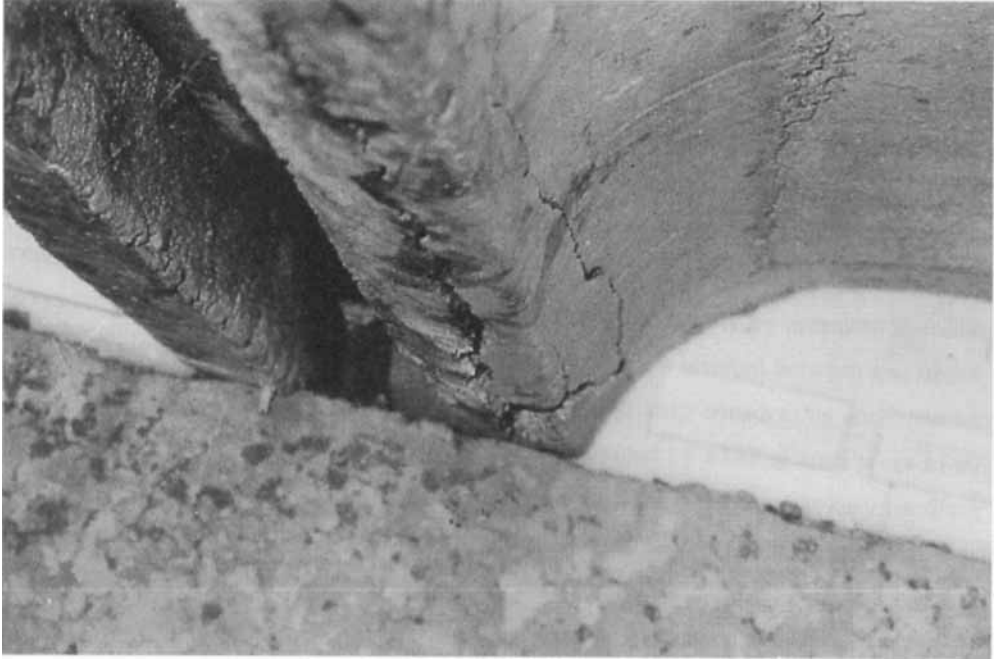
Heavy corrosion damage in precast ground floor elements.
